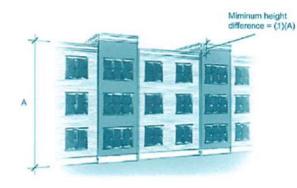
Typical ordinance-driven architectural details that require walls to have "reveals" in exterior walls, creating numerous inside/outside corners.
